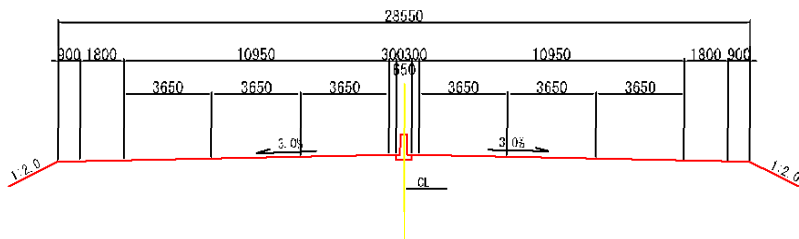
Typical Cross Sections of New and Existing Kanchpur Bridge
